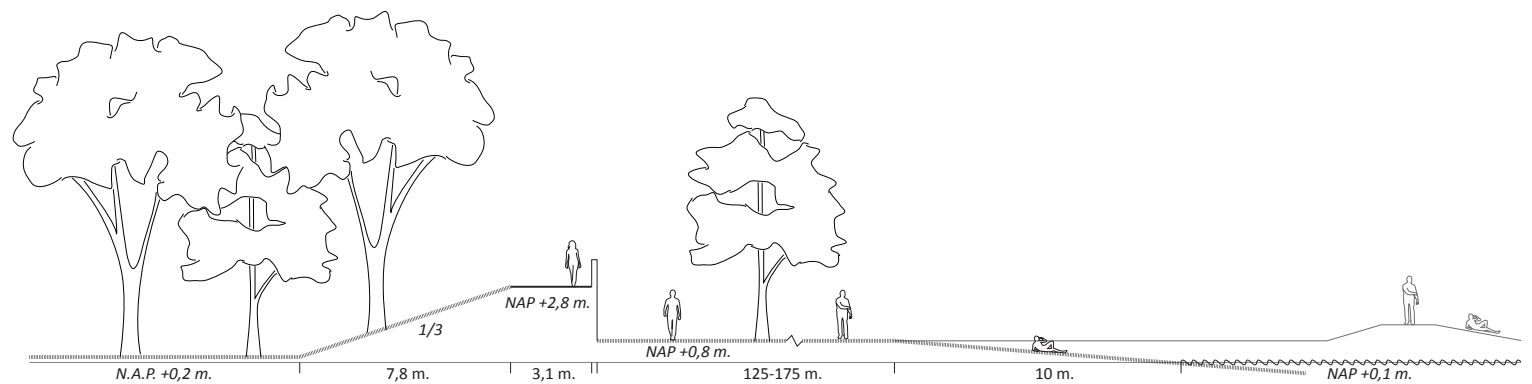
b: cross-section of the sea wall and the area in front of it
